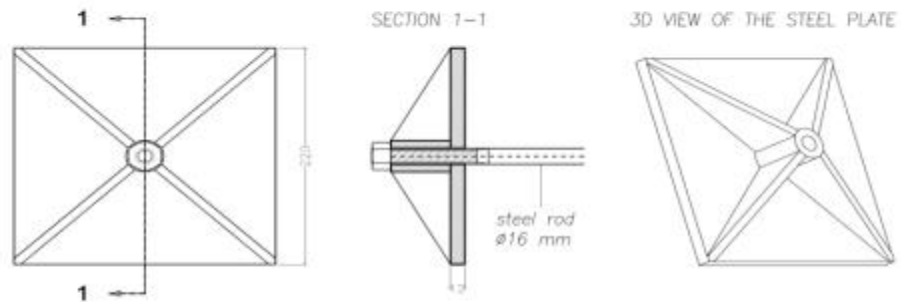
DETAILS OF THE TIE BEAMS - ANCHORAGE STEEL PLATES
